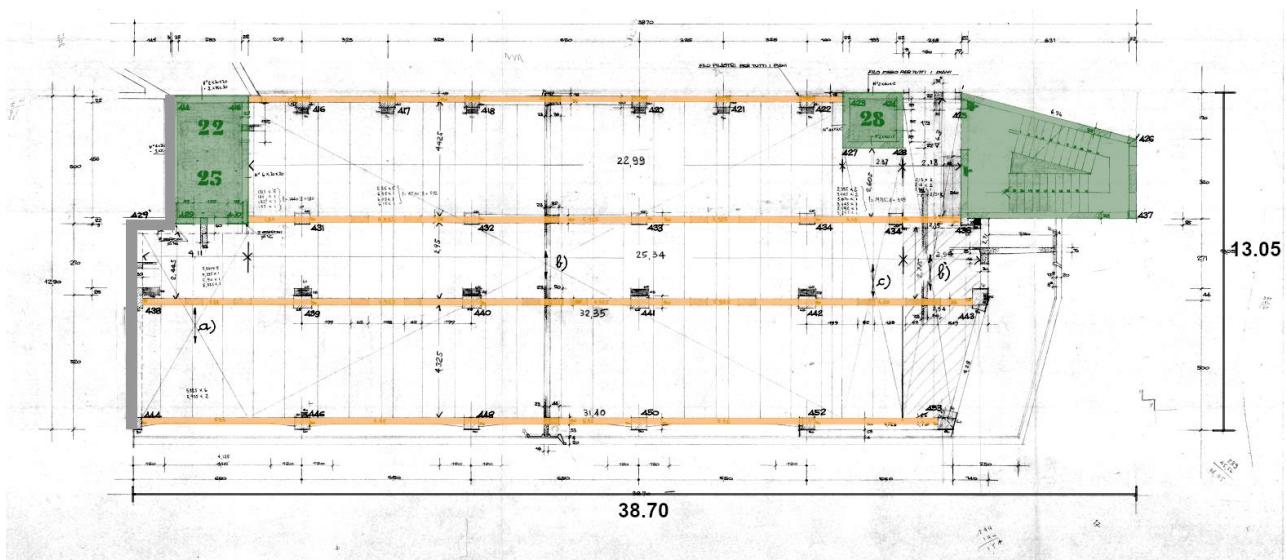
Structural plan (floor P1 to P9) of block E: in green stairwells-lift cores, in orange beams, and in grey expansion joints.
